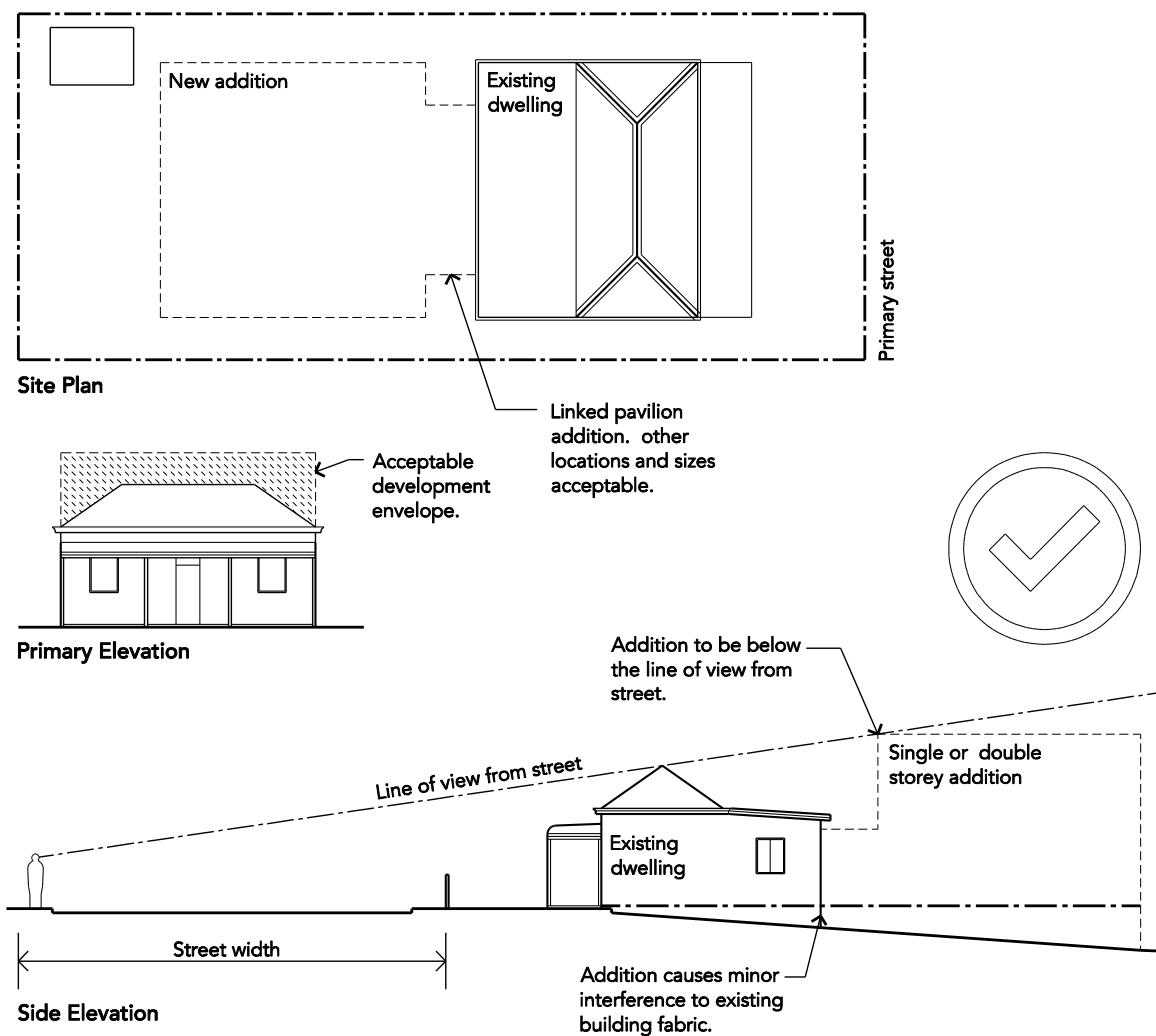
Plan and elevations illustrating compatible alterations and additions – Griffiths Architects 2012.
